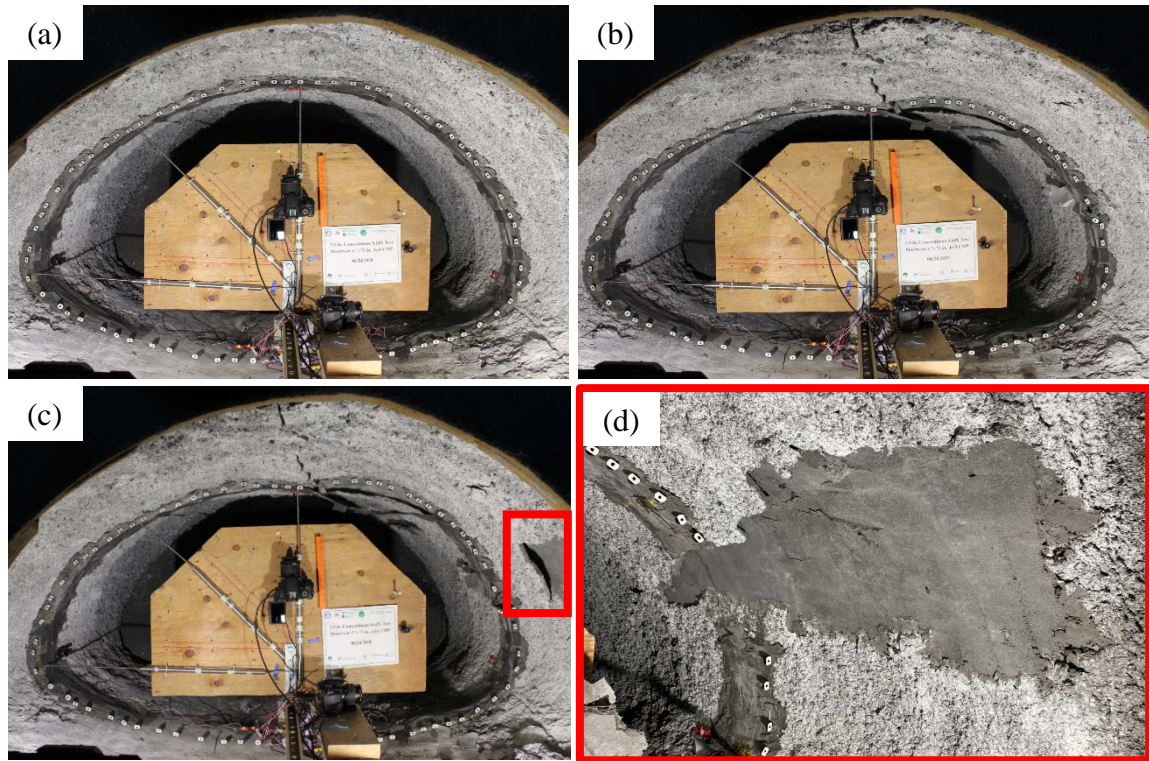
Invert-cut pipe arch renewed with 3 in. cementitious SAPL: (a) before loading, (b) after loading, (c) after unloading, and (d) delamination in the West springline.
